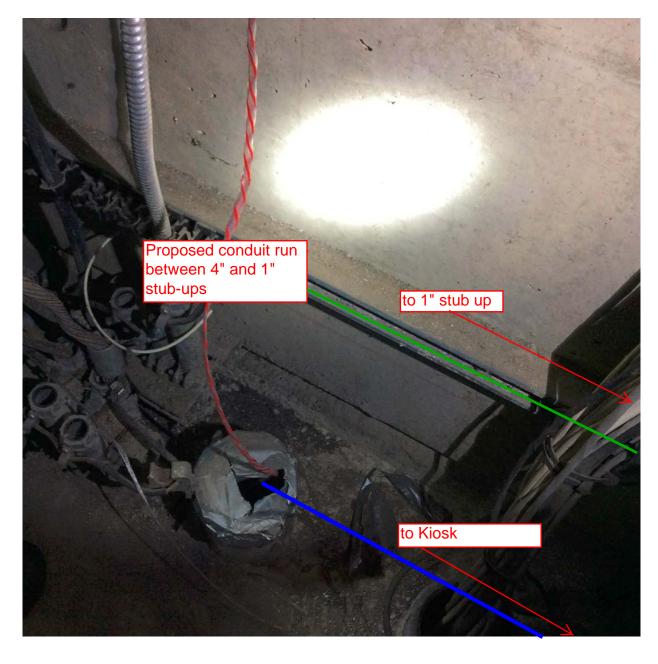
B35 New York Ave South: 1 inch stub up starting run to AFC Panel
